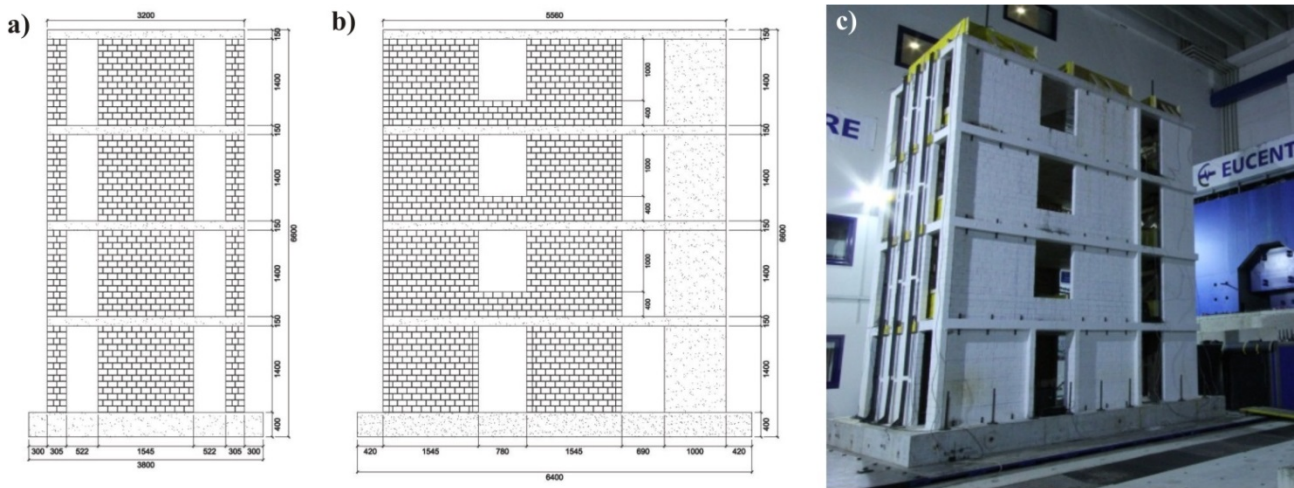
Dynamic test on building with RC and URM walls: Drawings of two North and West face of the buildings (a, b) and photo of the building before testing (c).
